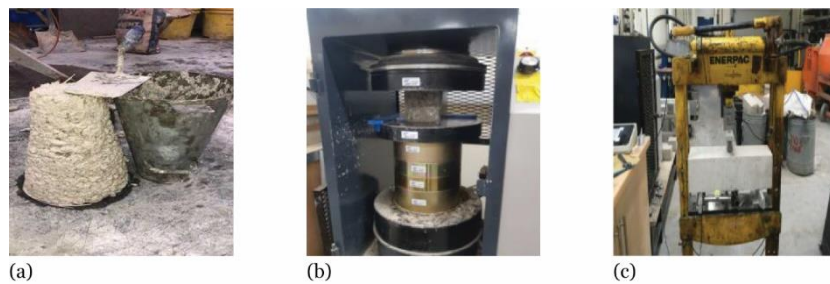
• (a) Slump testing, (b) compressive testing machine (Impact Test Equipment Ltd, Stevenston, UK) for testing of 100-mm cubes, and (c) three-point loading flexural testing equipment for 500 mm × 100 mm × 100 mm prisms/beams.
